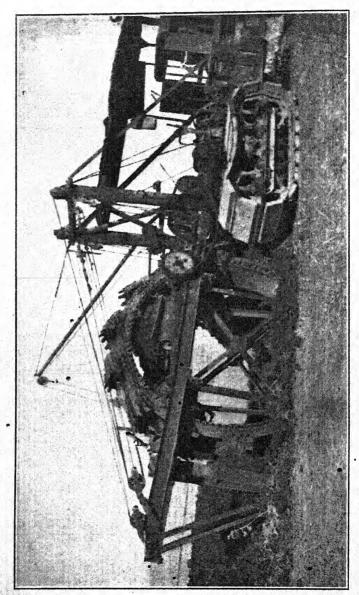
BUCKEYE TRENCHER IN COTTON SOIL. SYRIA
